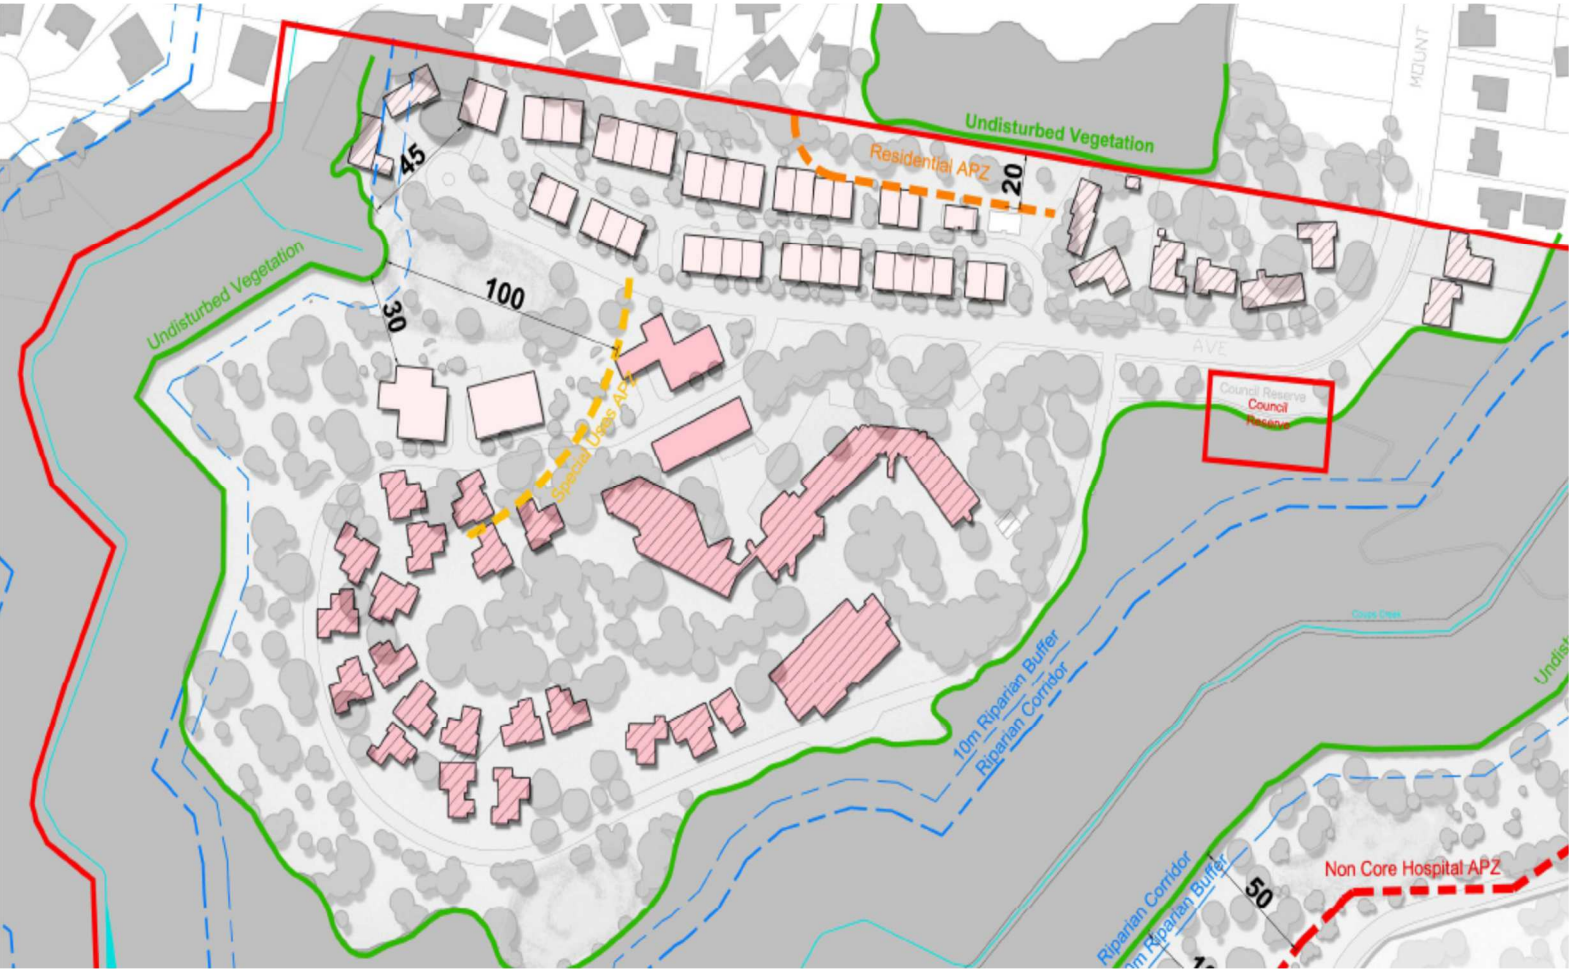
Expanded copy of the Church & School Precinct of the Approved Concept Master Plan.
